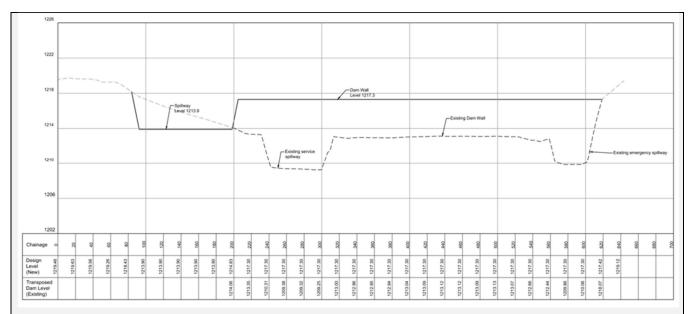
Longitudinal Section of Proposed Dam and Spillway
